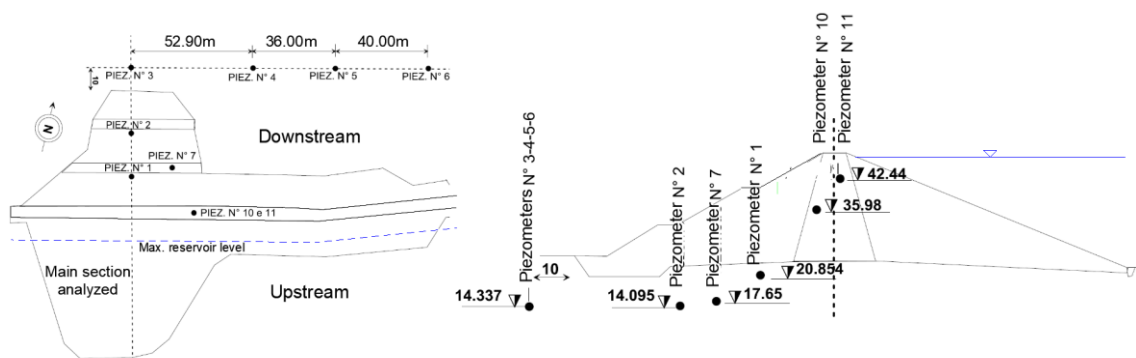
Plane view, cross-section, and location of the piezometers installed in the secondary dam.
